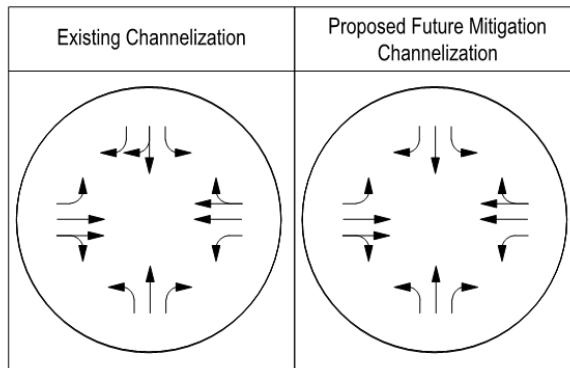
Channelization at the Seattle Hill Road/132nd Street SE Intersection
